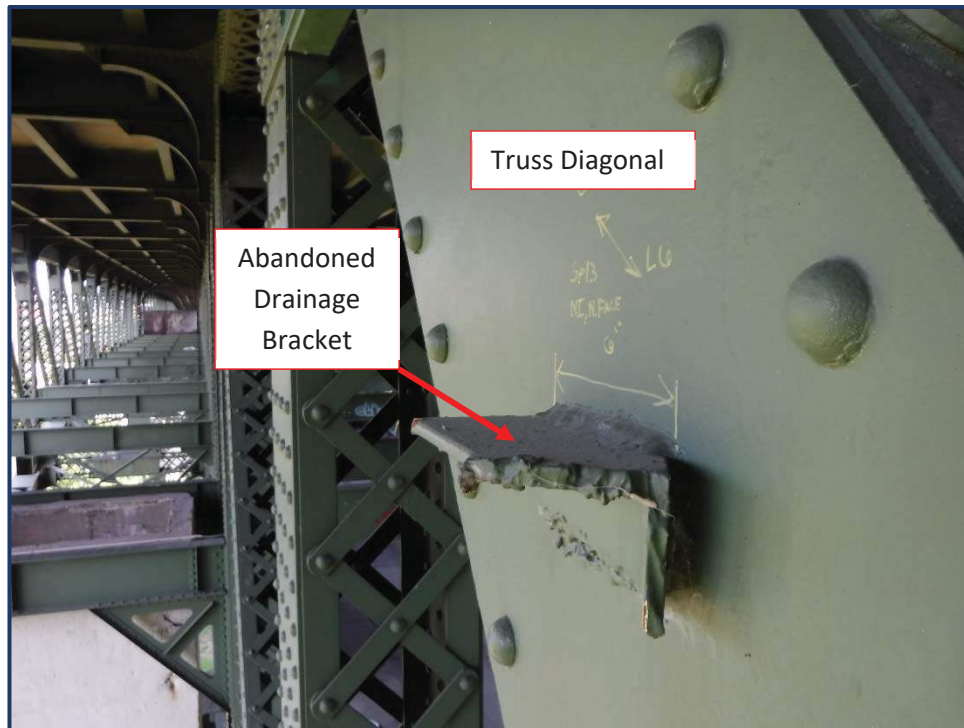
Abandoned Drainage Bracket on Truss Diagonal
